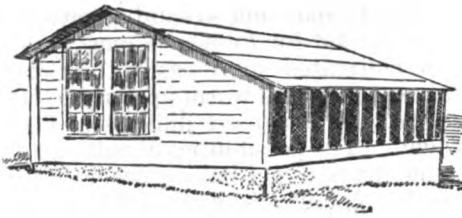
The "open-front" house provides plenty of ventilation without draughts so long as the other three sides are tight. This may require double wall construction in cold sections where cloth sash may well be used in front in addition to the wire screening.
